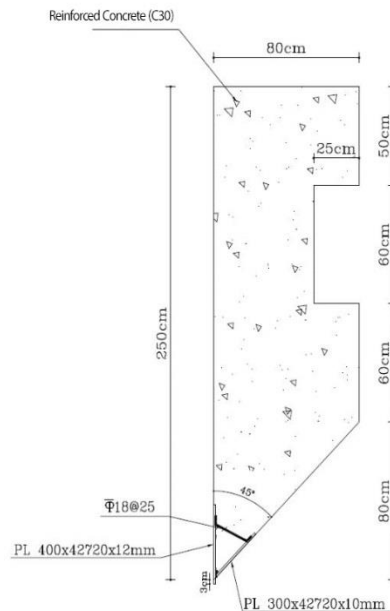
Architectural detail of first part of the wall with wedge-shaped section
